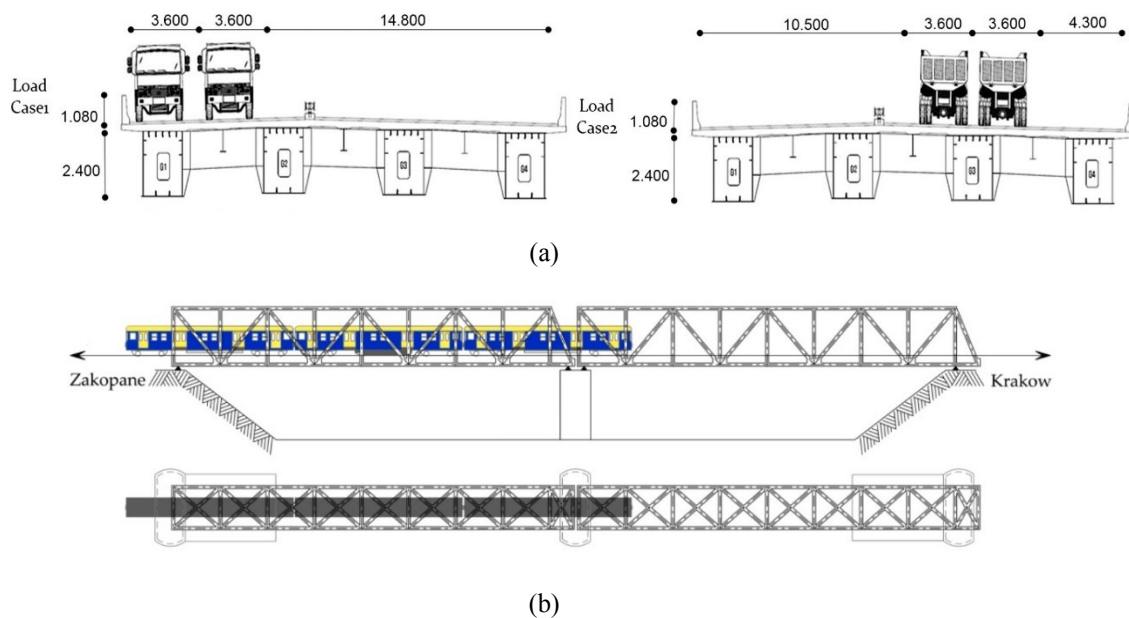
Static loading scenarios for deflection assessment: (a) Static loading scenarios for girder bridge ([Cha et al., 2019](#)); (b) Static loading scenario for railway bridge ([Gawronek and Makuch, 2019](#)).
